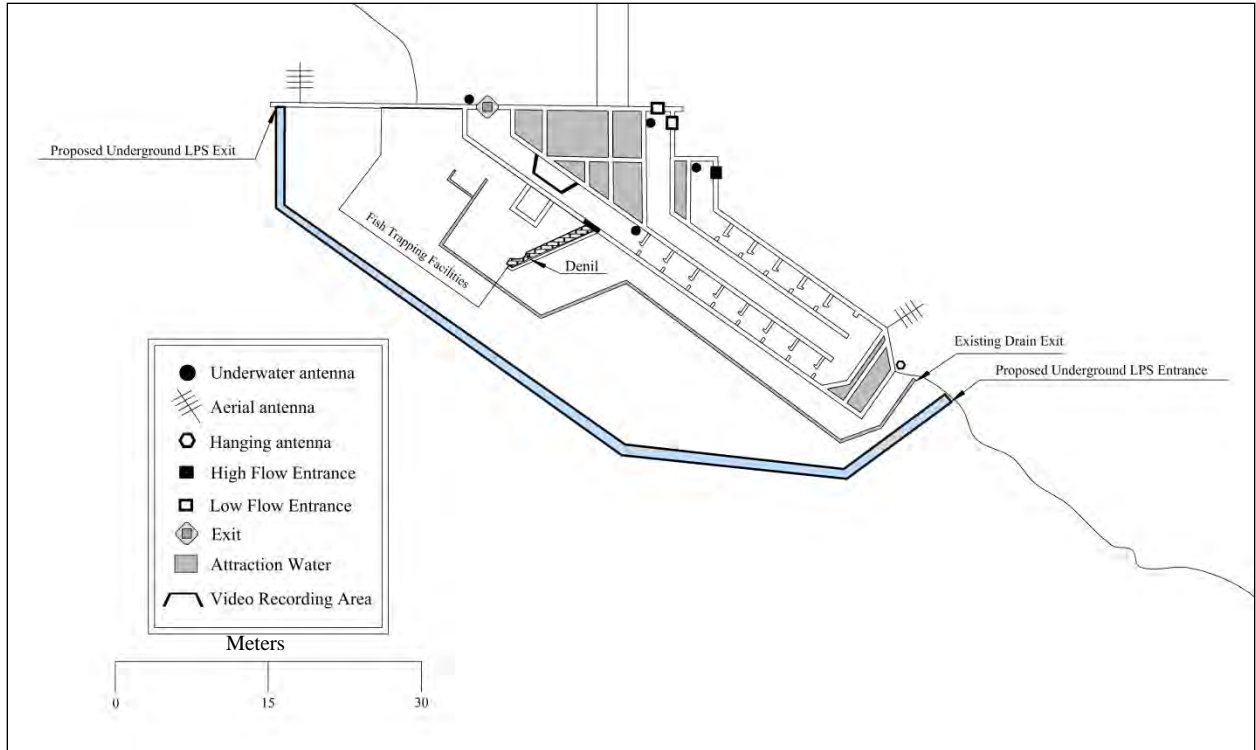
Proposed site and concept for an underground LPS on the right bank of Prosser Dam.
